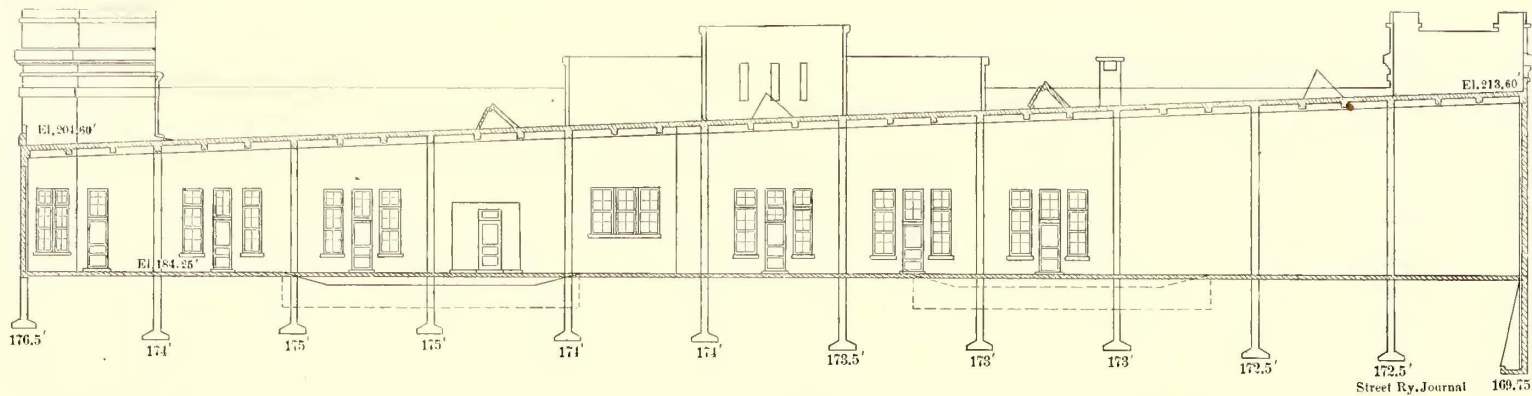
LONGITUDINAL SECTION LOOKING EAST; EDMONDSON AVENUE CAR HOUSE
